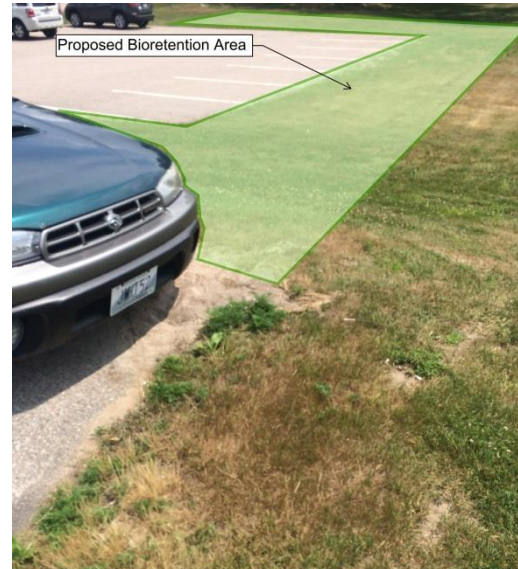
View of proposed bioretention area adjacent to parking lot at Tower Street School and Community Center. Direction of photo is looking northeast.
